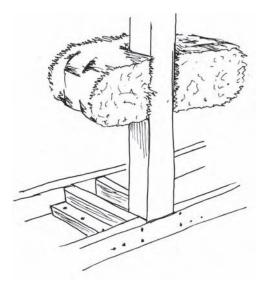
Securing of a load bearing post to the floor via bottom boxing
